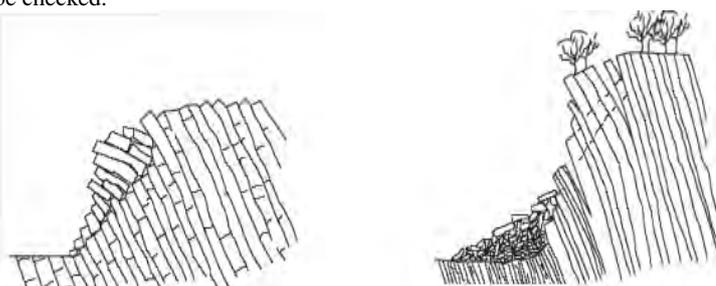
(a) Block Toppling Failure Fig 4.0(b) Flexural Toppling Failure
